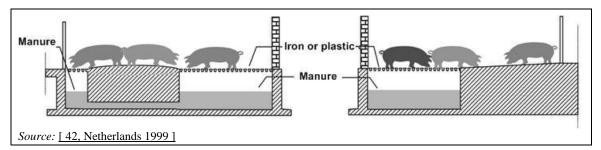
Partly slatted floor with a convex or sloped concrete floor
